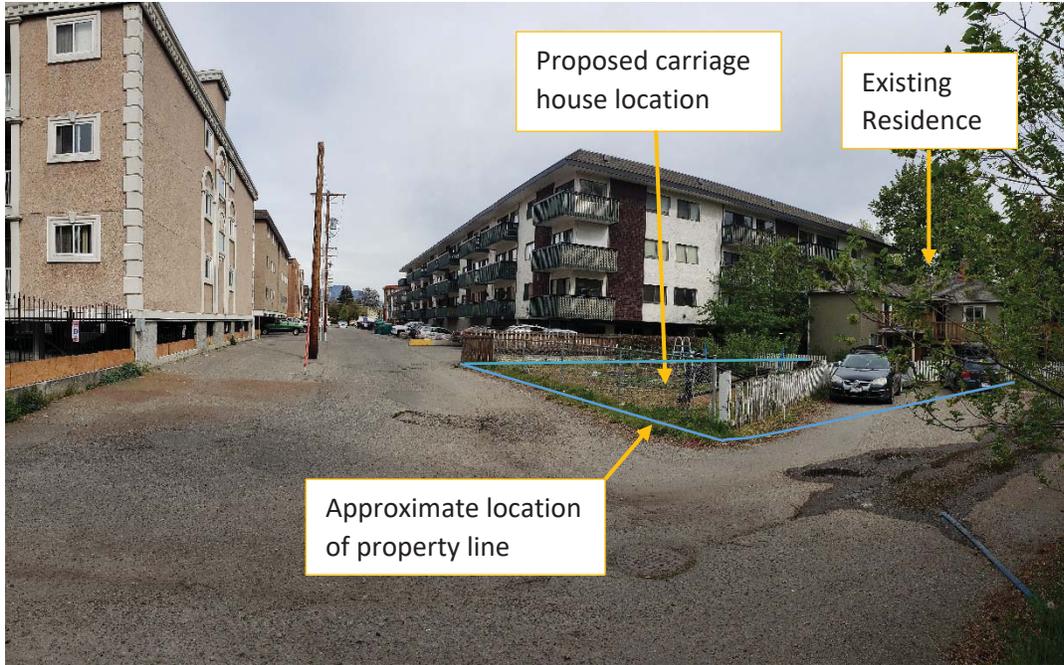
View of proposed carriage house location with four-story apartments located immediately to the north and east. Photo taken facing east.
